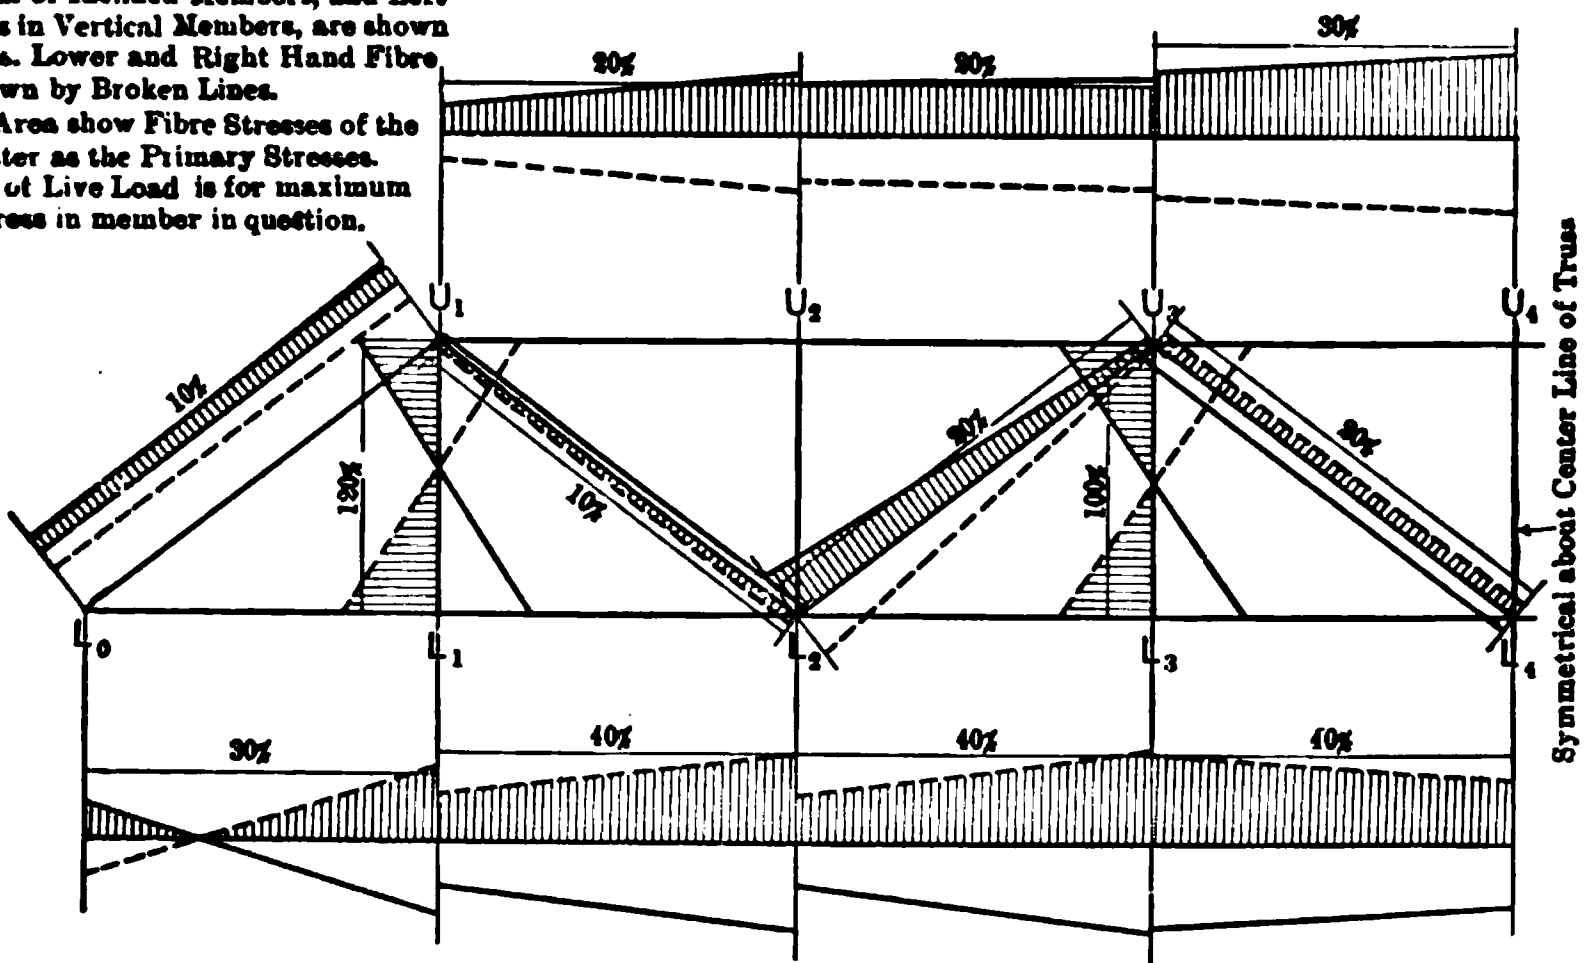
Secondary Stresses in a Riveted Warren Truss.
